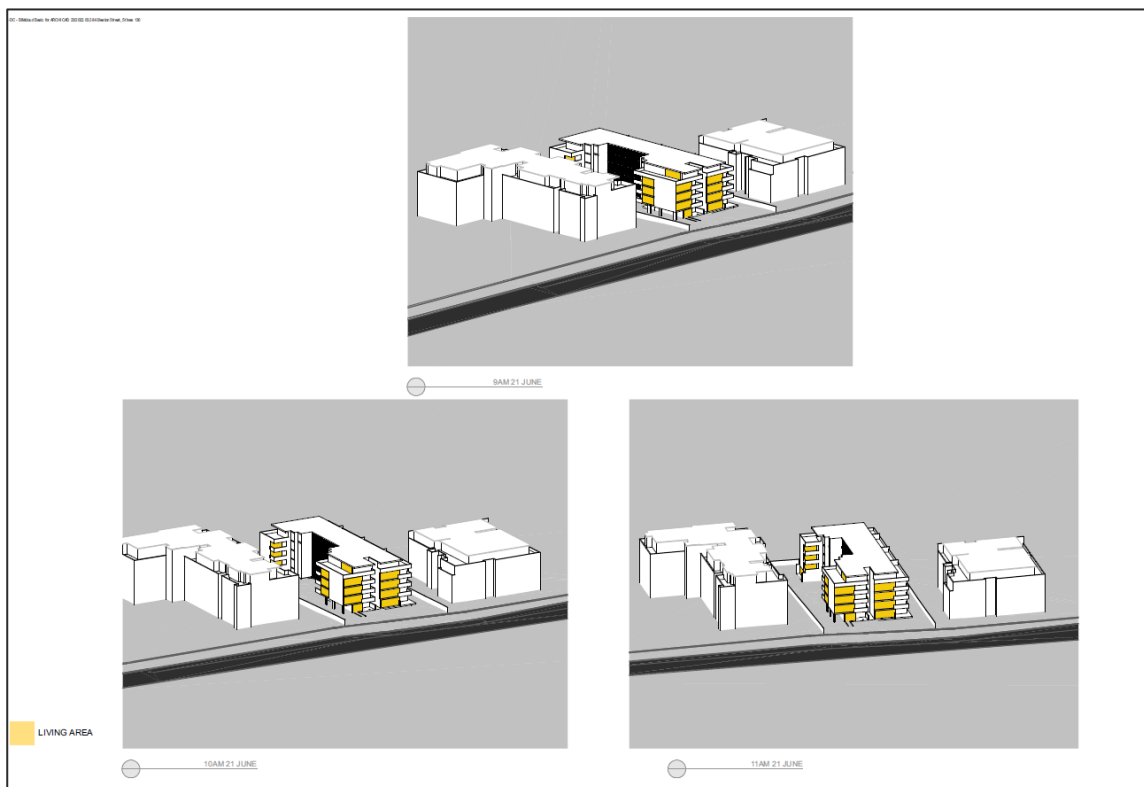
Proposed building massing with 9am-11am solar access (Source: mackenzie architects concept architectural plans)
